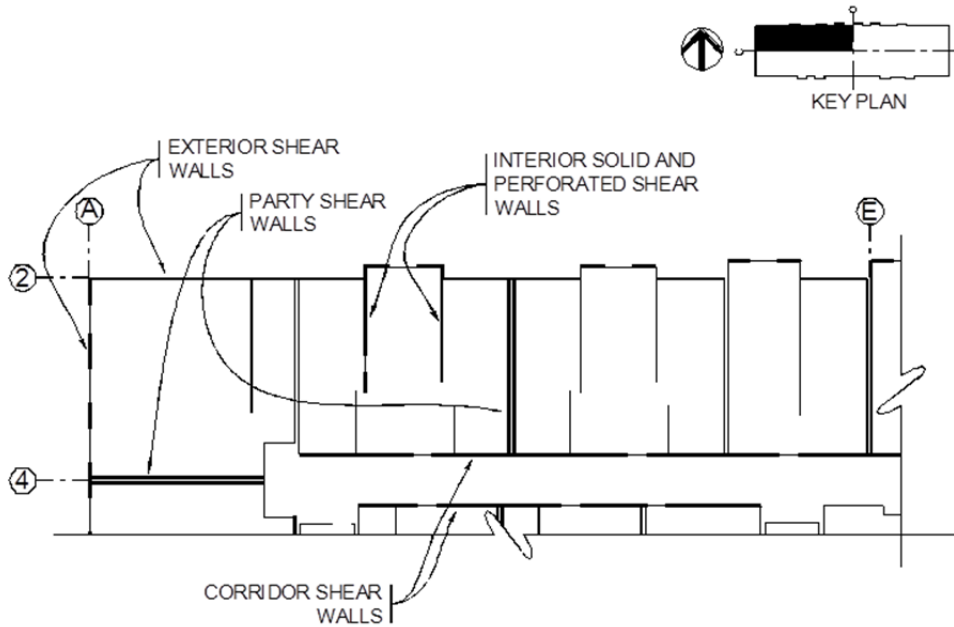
Plan of shear walls (northwest corner) for current national seismic code design.
